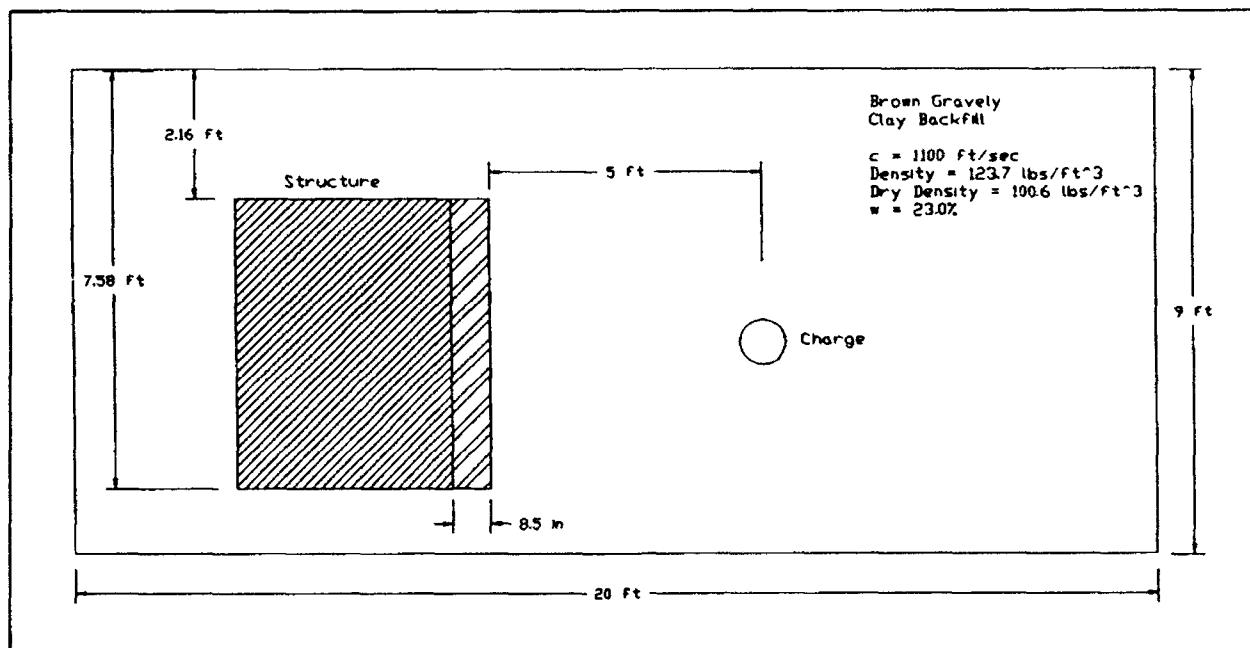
Section through CONWEB 2 test bed showing backfill properties
